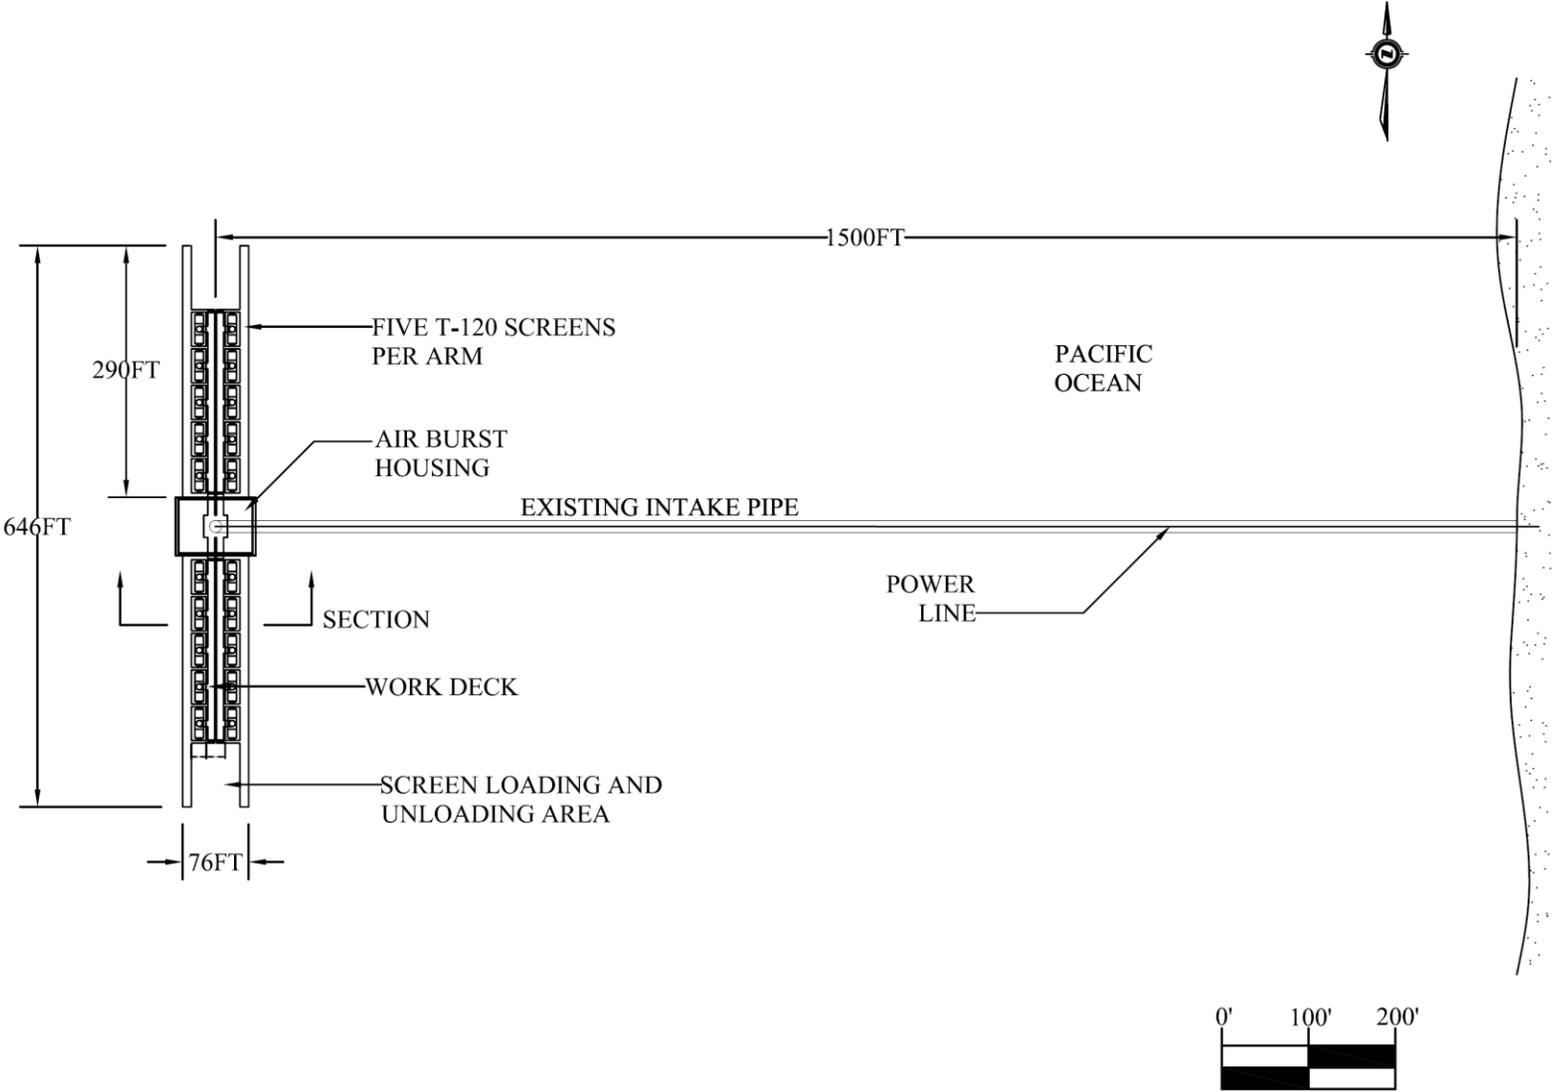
Wedgewire Layout 1 "Tee"- Section
